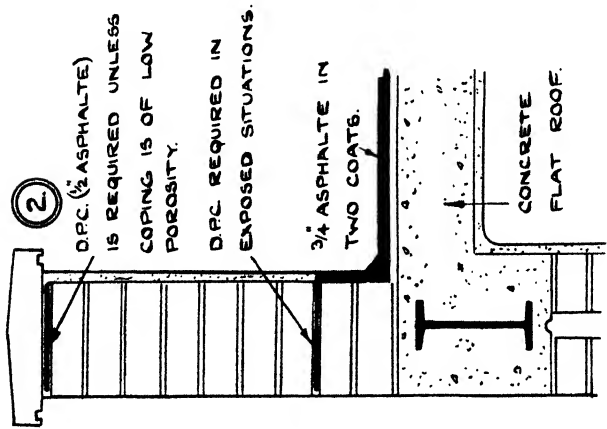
PARAPET WITH BRICK EXTERNAL FACE AND RENDERED INTERNAL FACE
